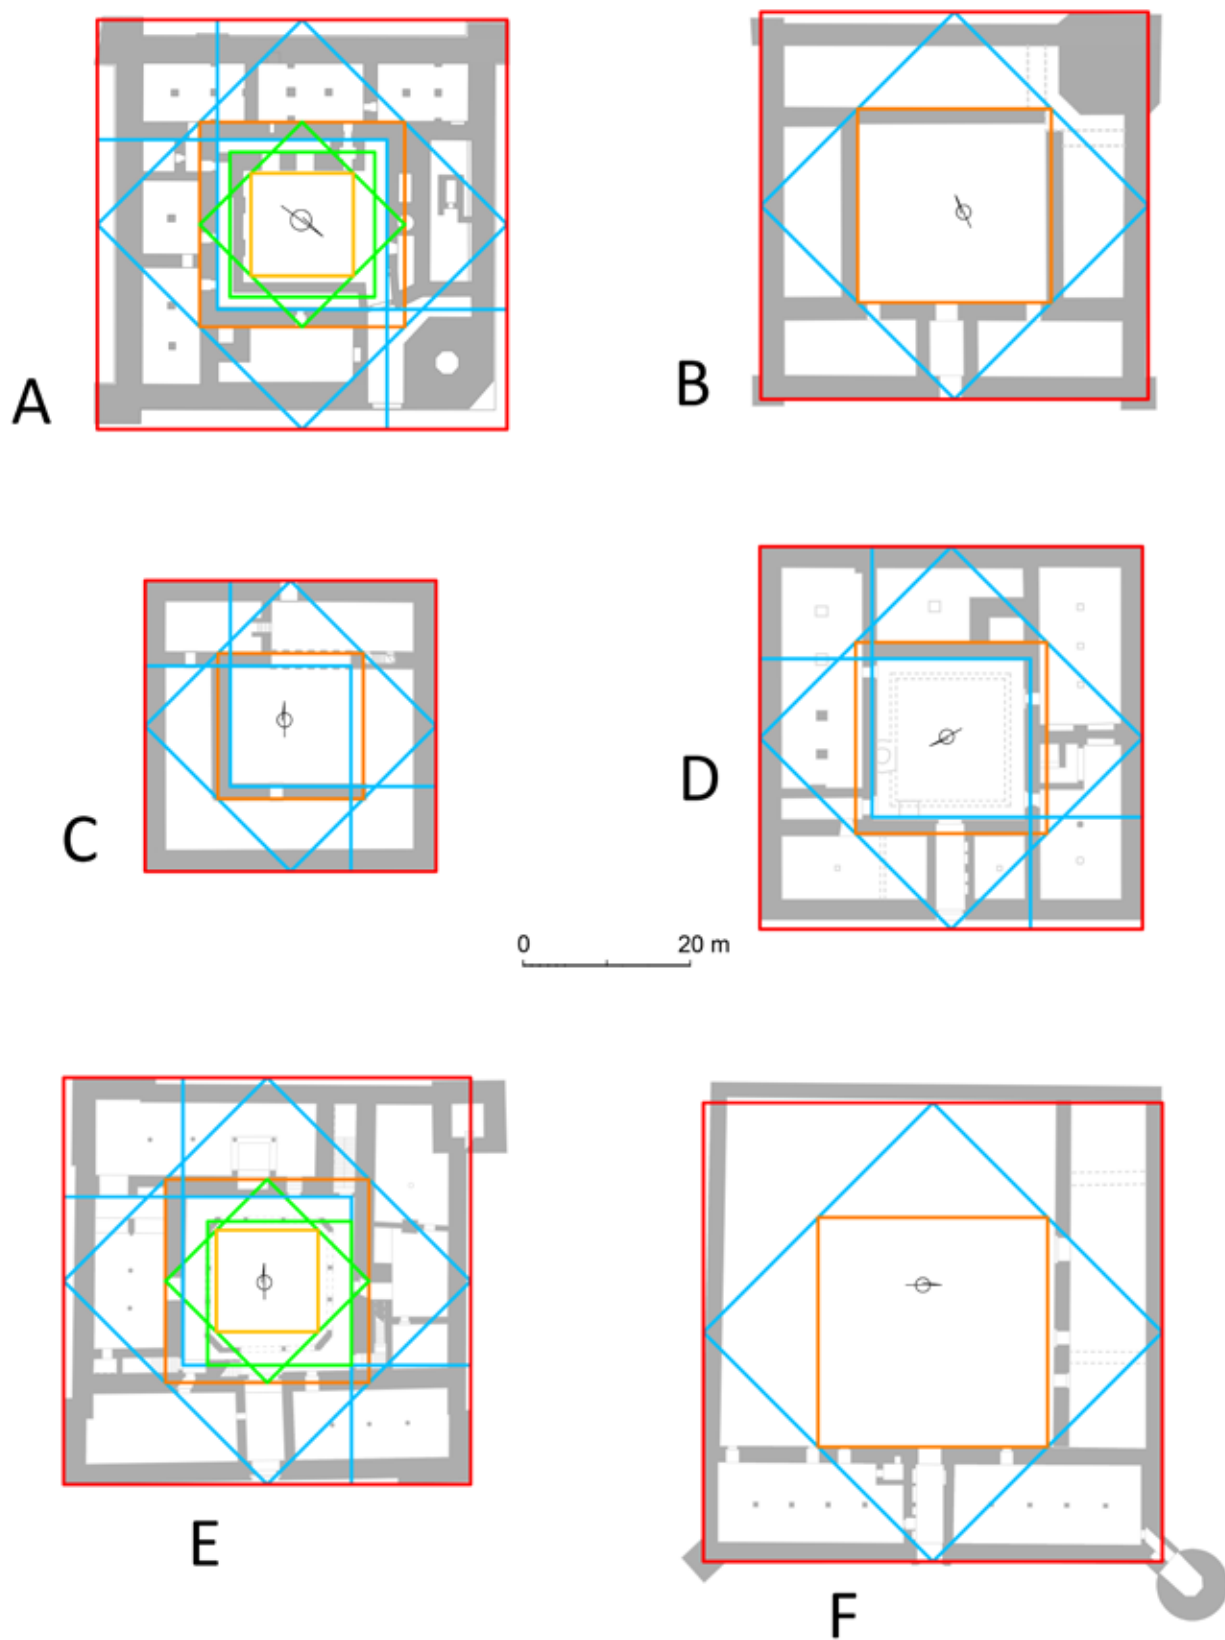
Drawings *ad quadratum* of selected castles plans: A – Brodnica, B – Gniew, C – Nieszawa (Mała Nieszawka), D – Ostróda, E – Lidzbark Warmiński, F – Barciany. Drawing B. Wasik. – Abb. 10. Aufzeichnung des Grundschemas in den Grundrissen der ausgewählten Objekte: A – Brodnica, B – Gniew, C – Nieszawa (Mała Nieszawka), D – Ostróda, E – Lidzbark Warmiński, F – Barciany. Zeichnung B. Wasik.
